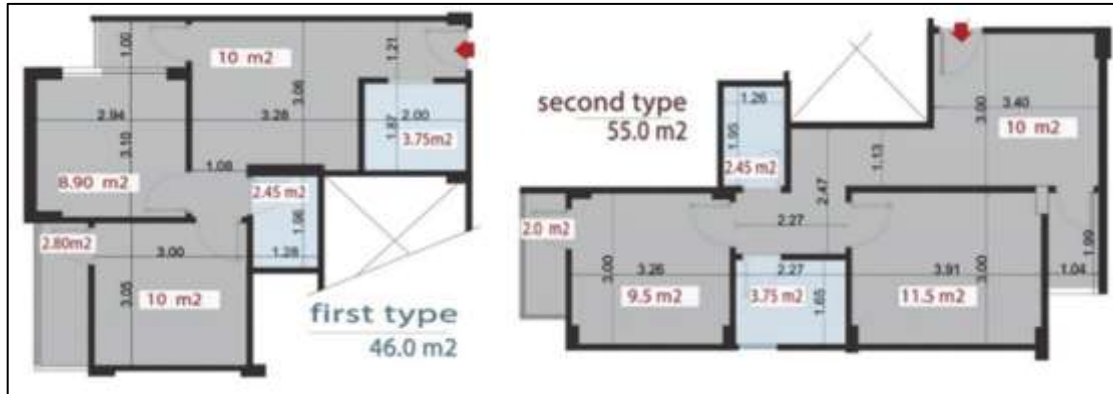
Plan of Two Types With Two Rooms, Living Room, Terrace, Kitchen And Bathroom [50].
